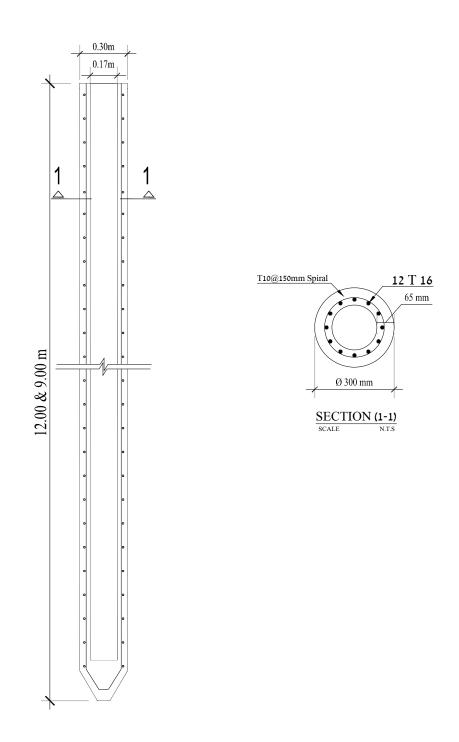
Schematic diagrams of piles cross section and length for site S-13, Baraba
